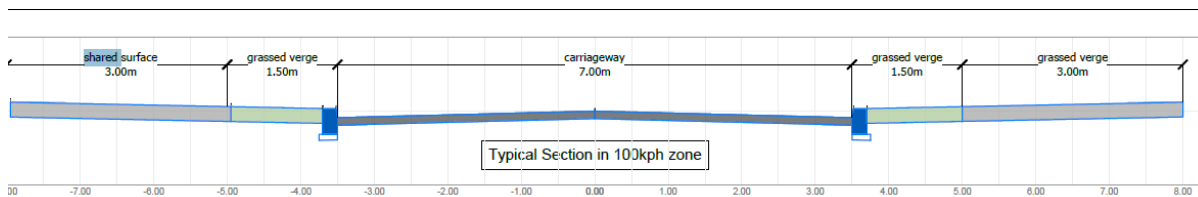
Typical Section at 100kph zone / Ch. 0m to Ch. 810m
